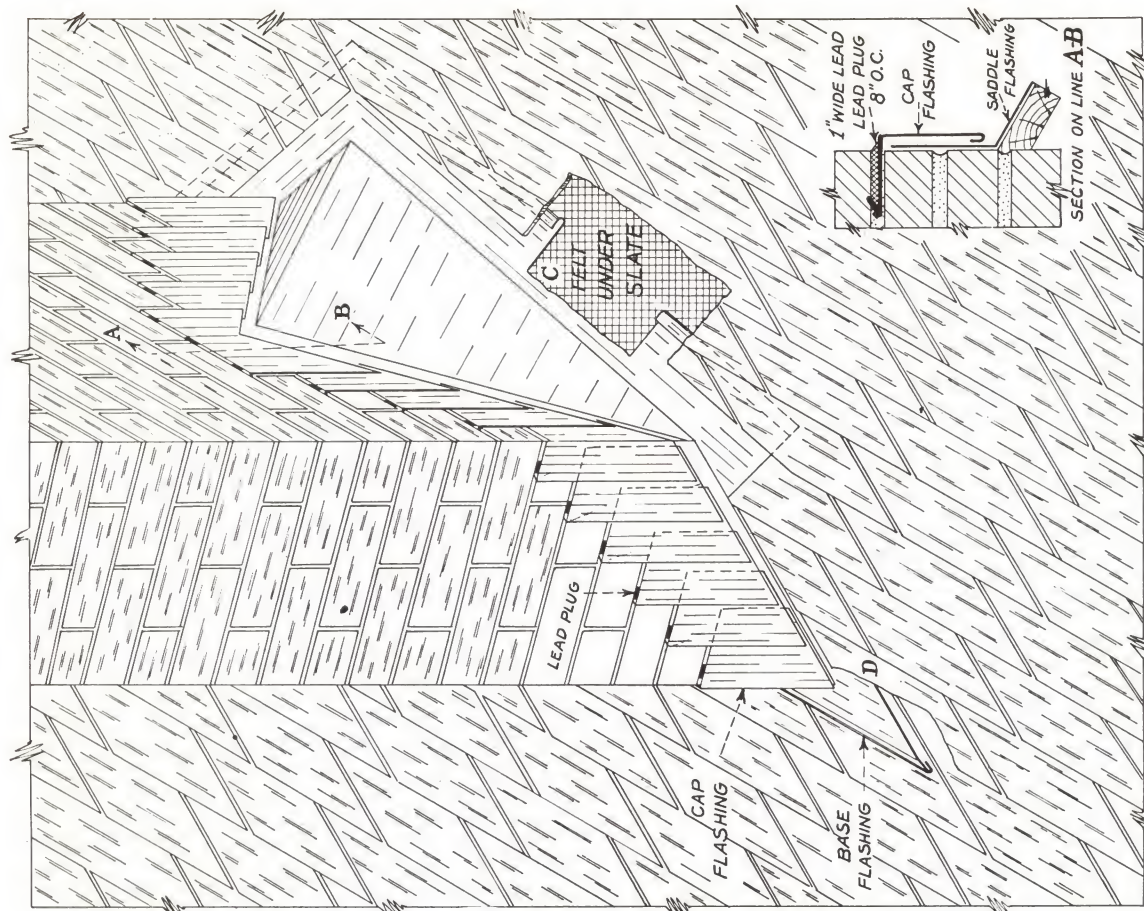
PERSPECTIVE VIEW SHOWING FLASHING AT SIDE AND REAR OF CHIMNEY FOR SLATE, FLAT TILE AND SHINGLE ROOFS
